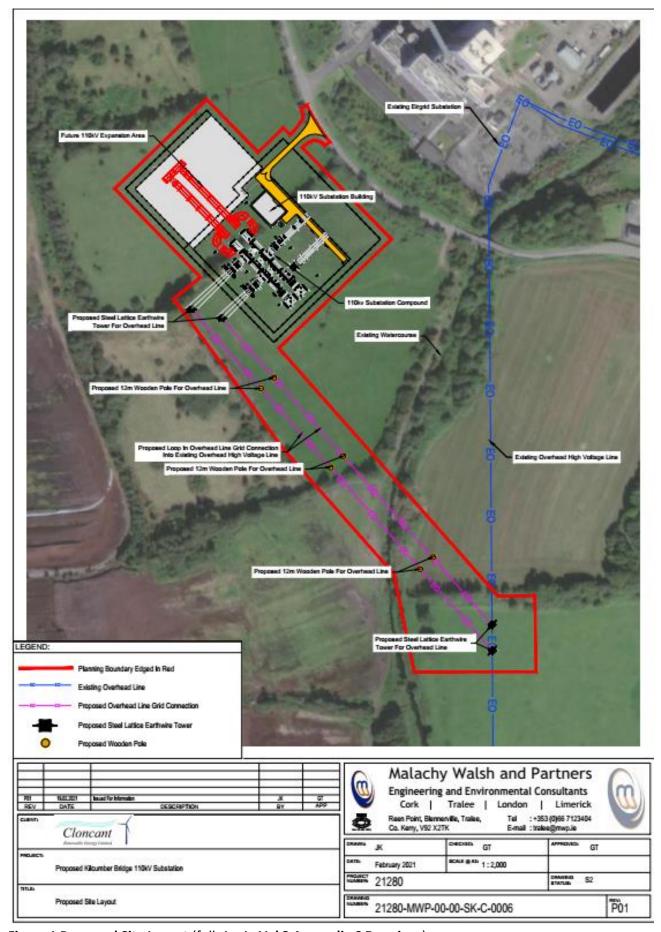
Proposed Site Layout (full size in Vol 3 Appendix 6 Drawings)
